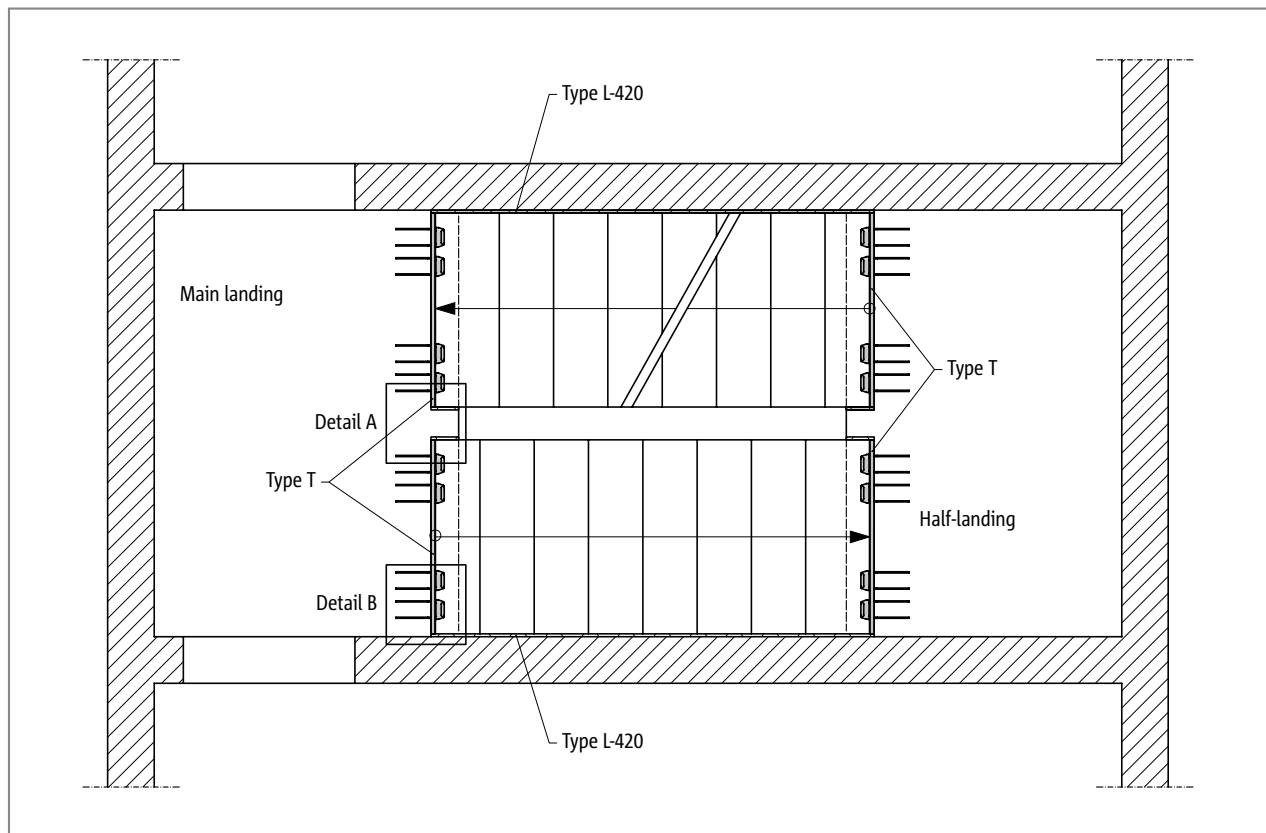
Schöck Tronsole® type T: Element configuration in plan view
